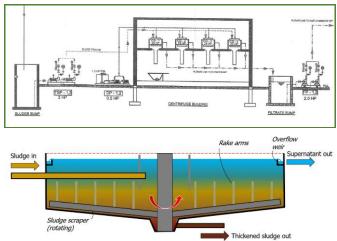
STP stage 4th -- On Site Drawings and Plans
